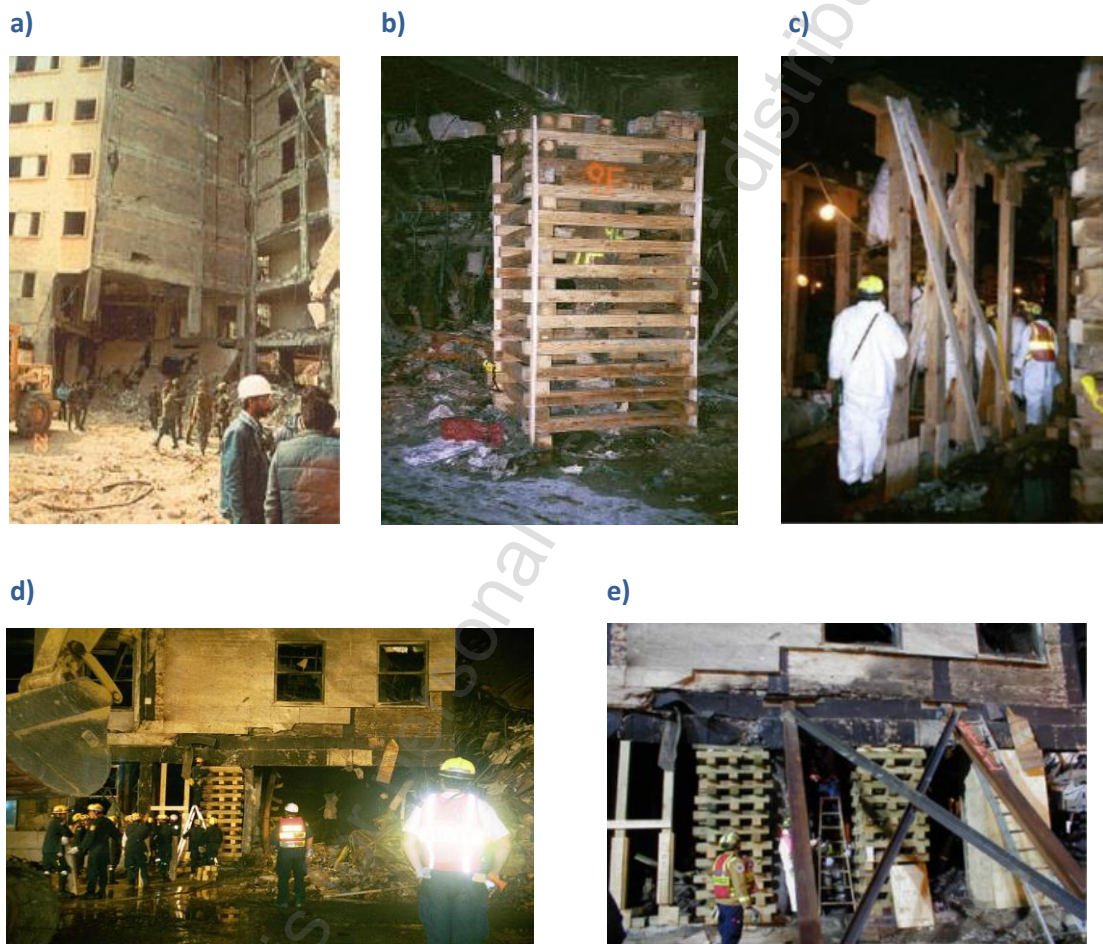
Terrorist attack on the Pentagon building, Washington: a) reinforced concrete infilled frame acts like a shield, compensating for the lost columns; b) single point support of the severely damaged columns; c) vertical support; d) shoring operation; e) supporting with raking shores
